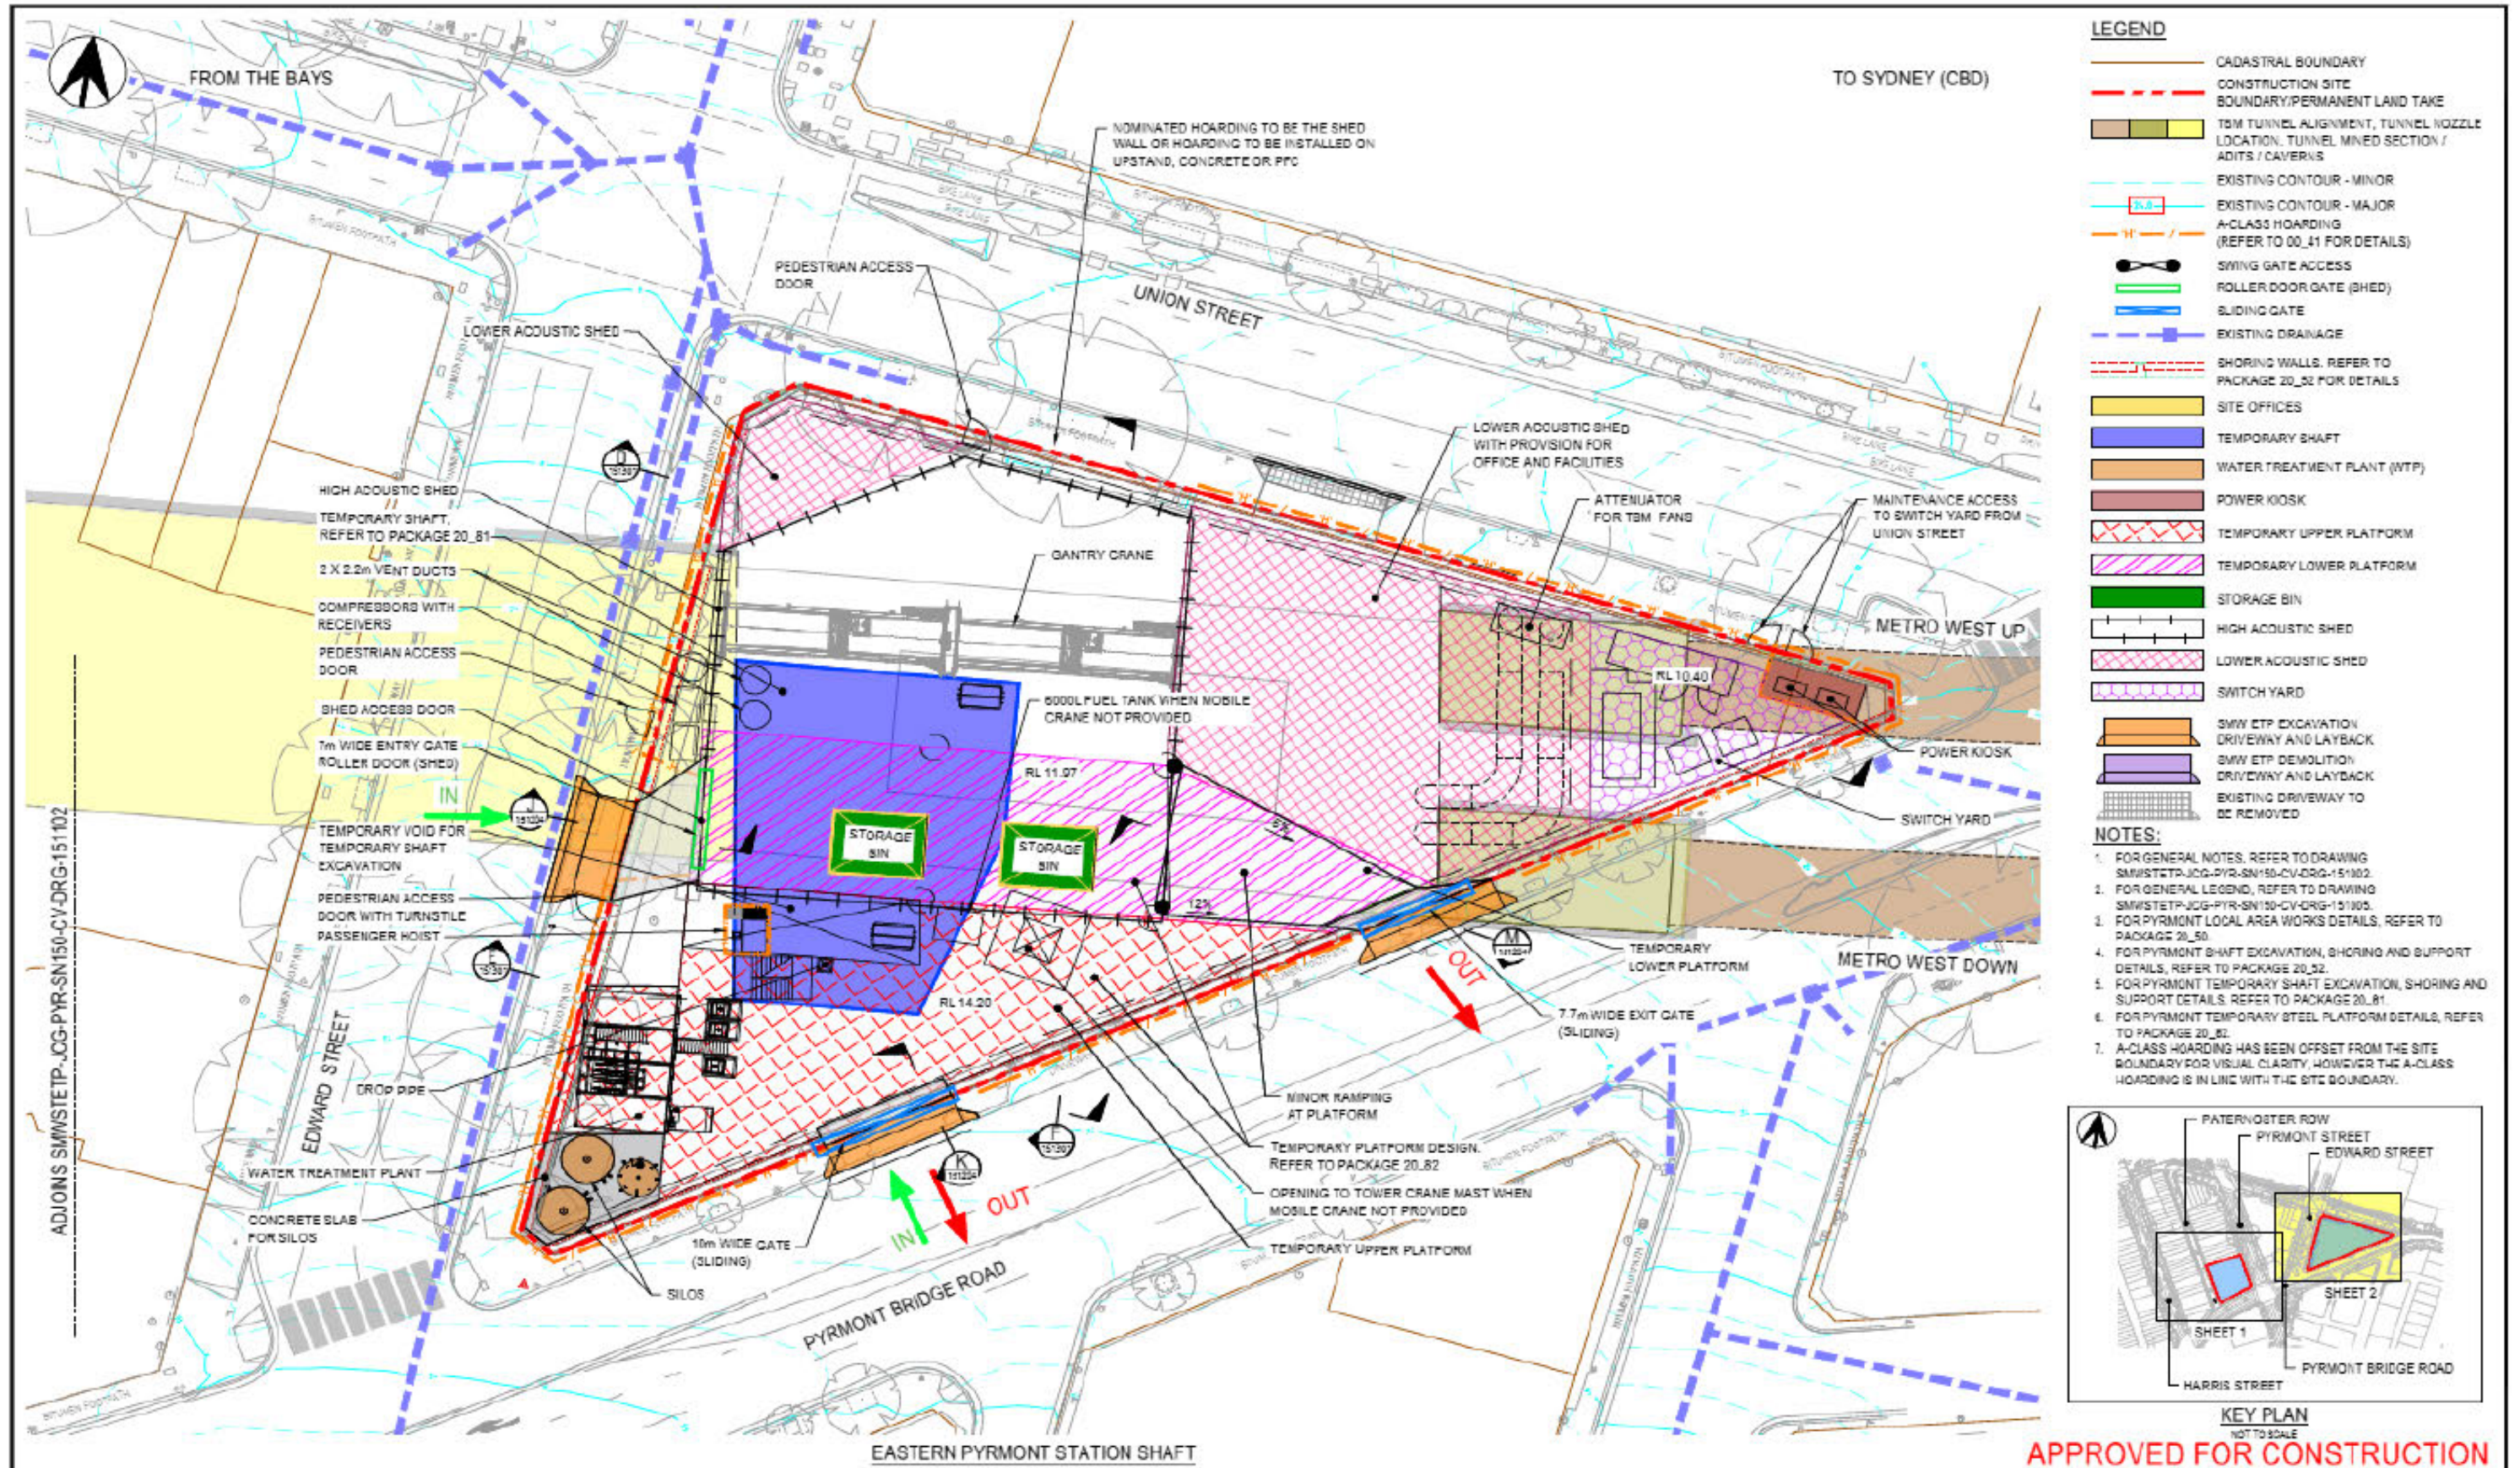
Site Layout and Hoardings (Stage 1)
